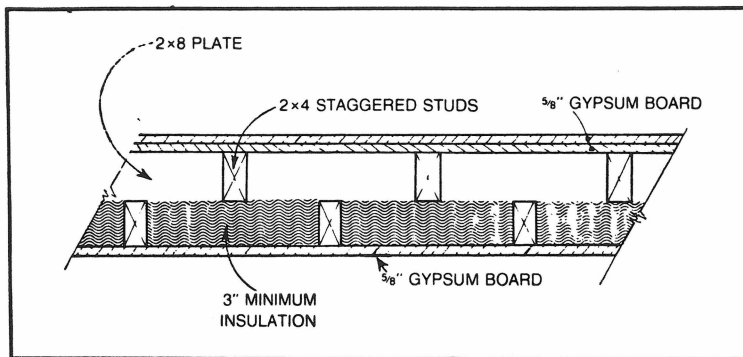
Constructional details of studio and control room walls to protect against external noise and to provide adequate isolation between control room and studio.
